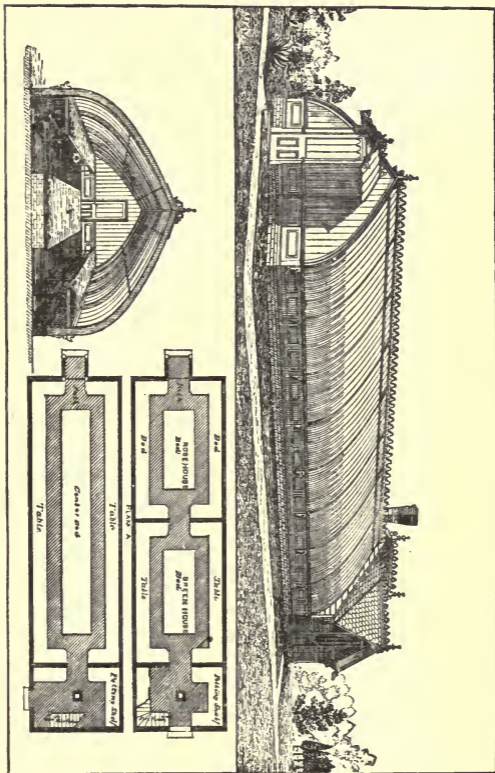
GREENHOUSES, EGG HOUSE, AND POTTING ROOM.—From Lord & Burnham's Book of Plans.
